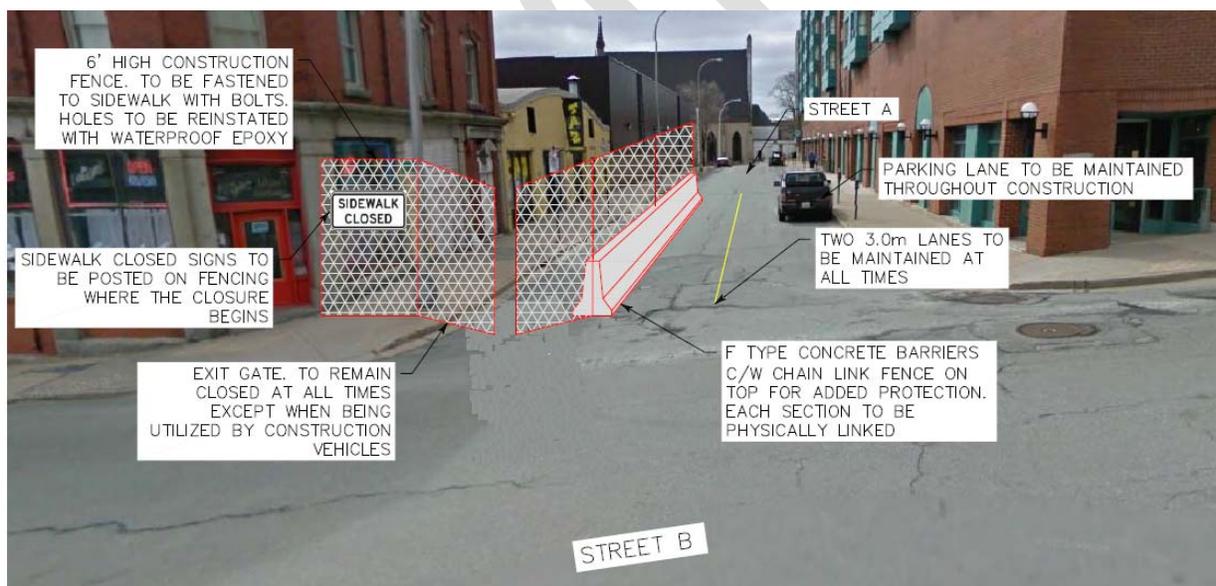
Proposed delineated vehicle staging and delivery area; Street A. The Sidewalk is to be closed along this portion of the site; pedestrians must use the sidewalk on the other side of Street A.
